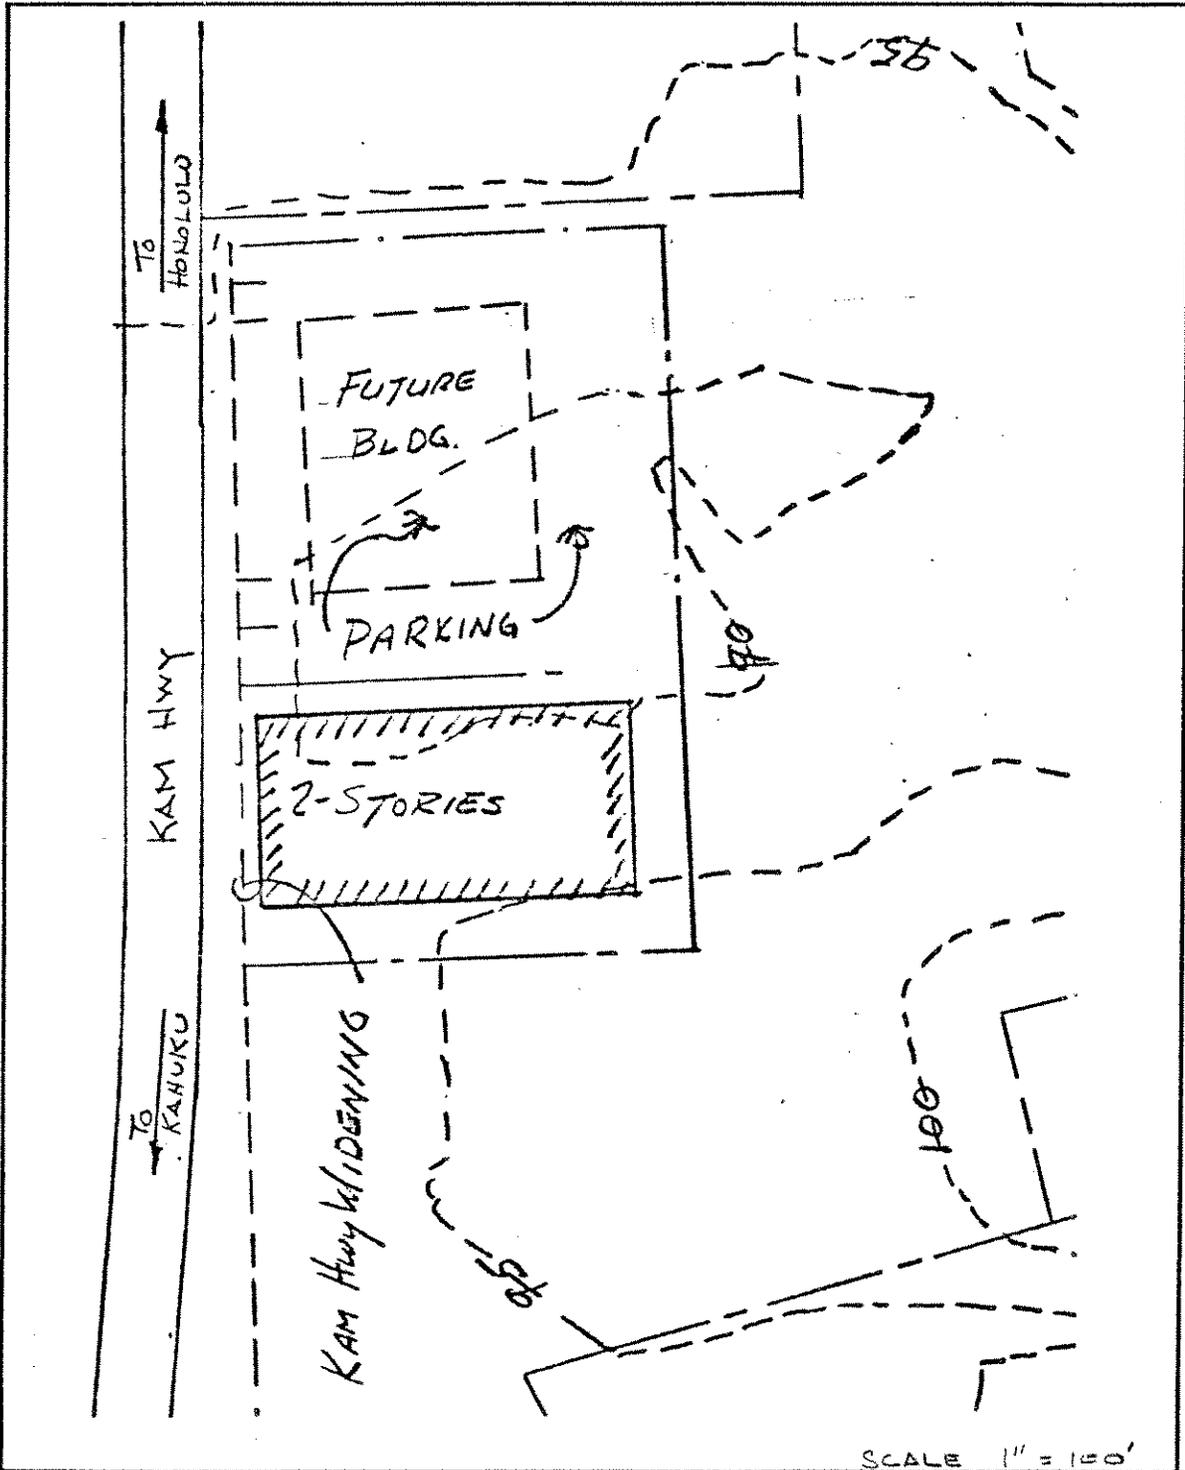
SITE SCHEME - ALTERNATIVE SITE 3
